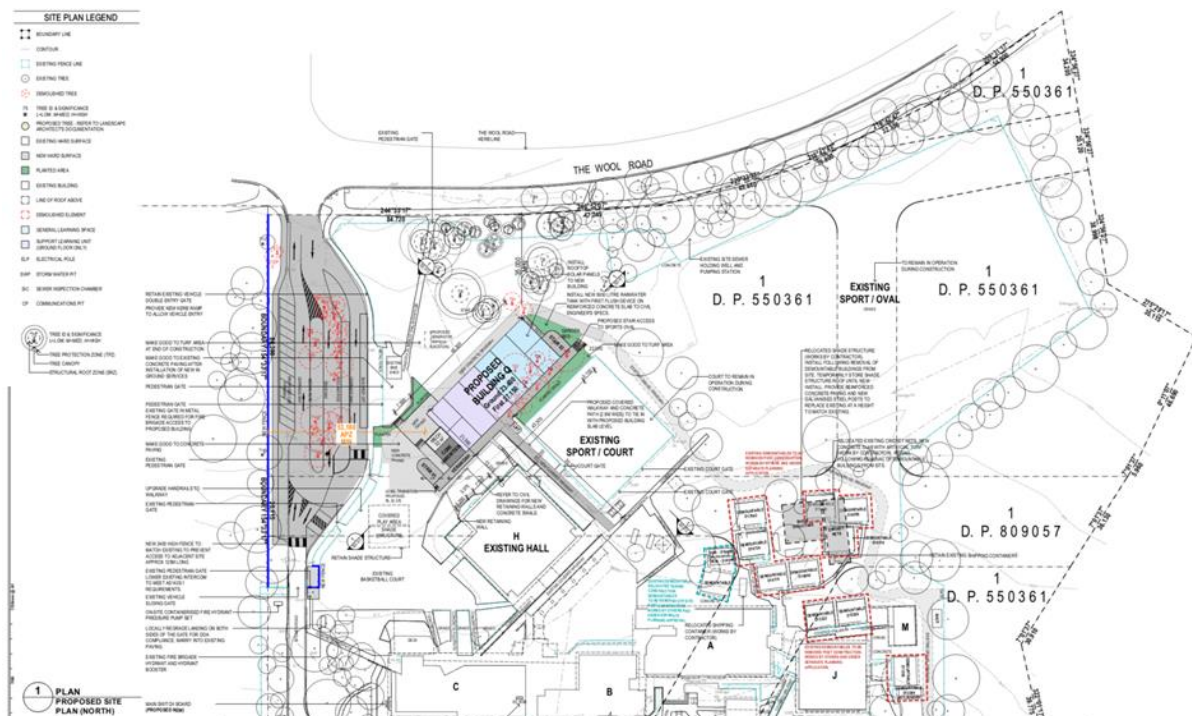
Site Plan (Source: Fulton Trotter, 2025)
